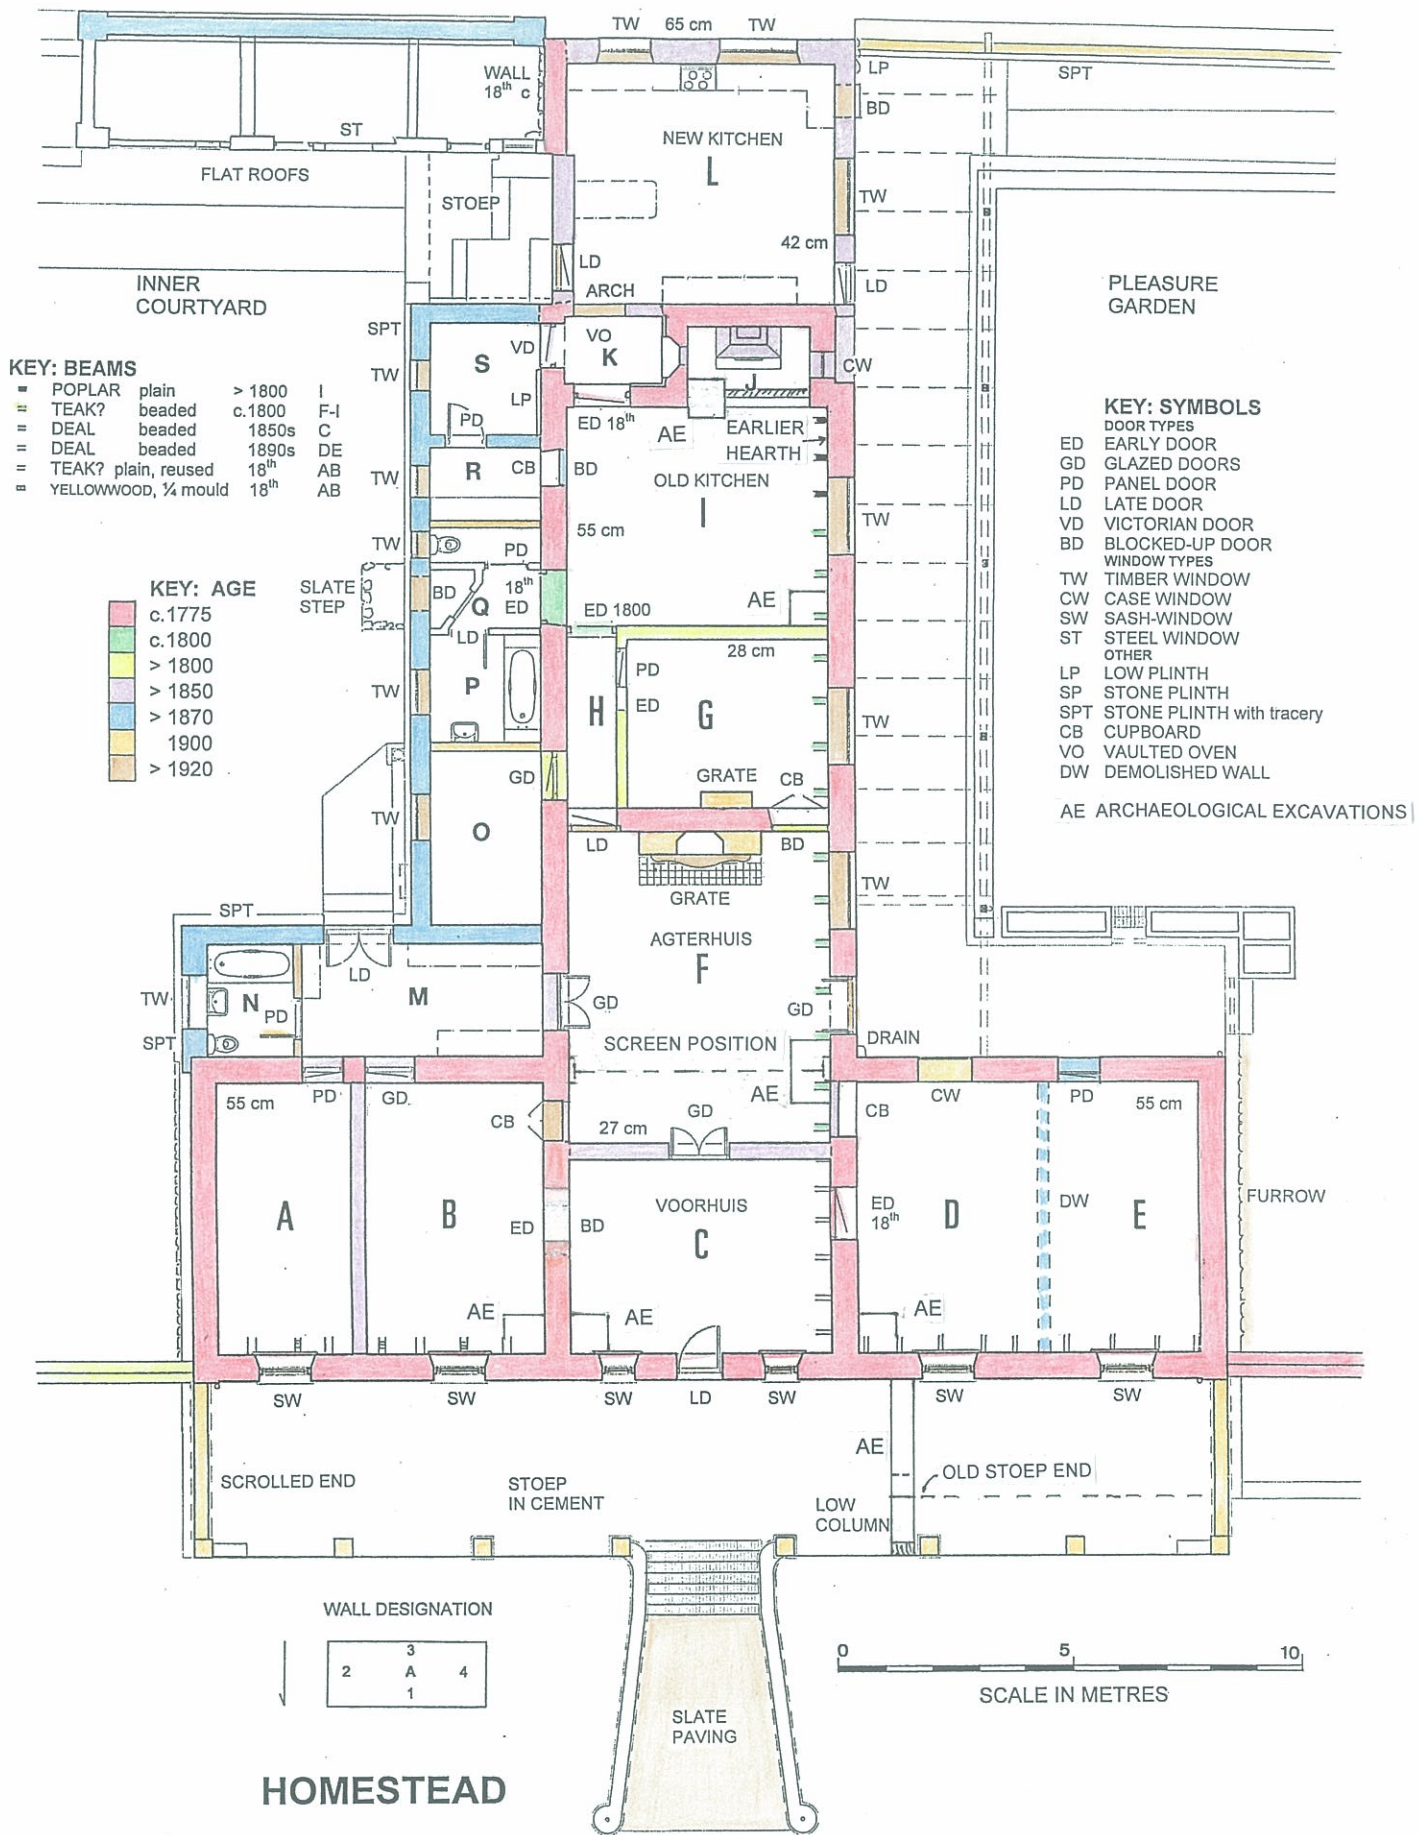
Site plan of the T-plan Homestead, when the latest excavations and information have been added (DMP 2011; Amendments Vos 2011, 2013).
